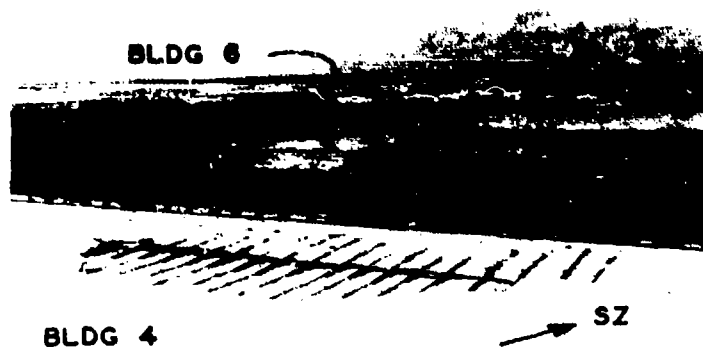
Post-Elder, (Item 26) Station 3.1.1, destroyed roof section of Building 6 and damaged area to roof at south end of Building 4. Pressure level: Elder, 20 psi.
